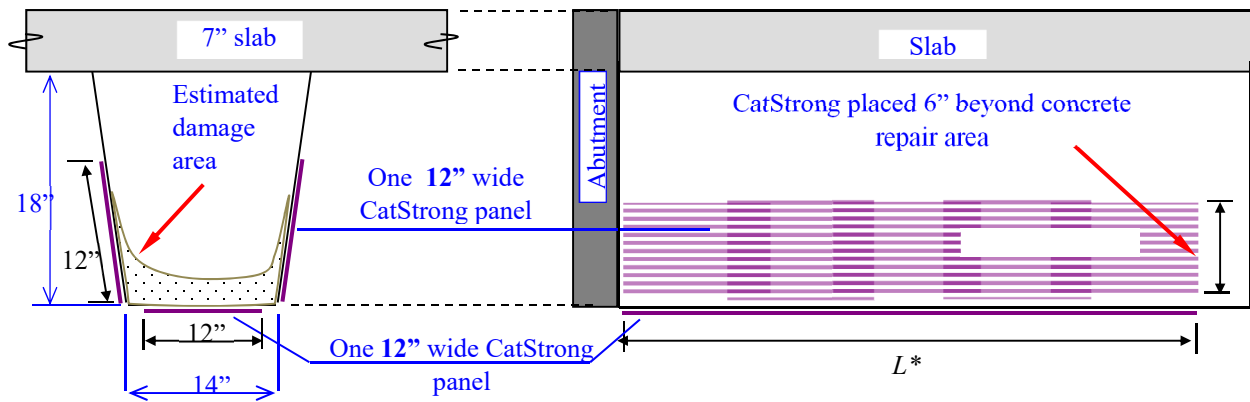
Typical placement of CatStrong panels on KY 55 over Majors Run Creek
